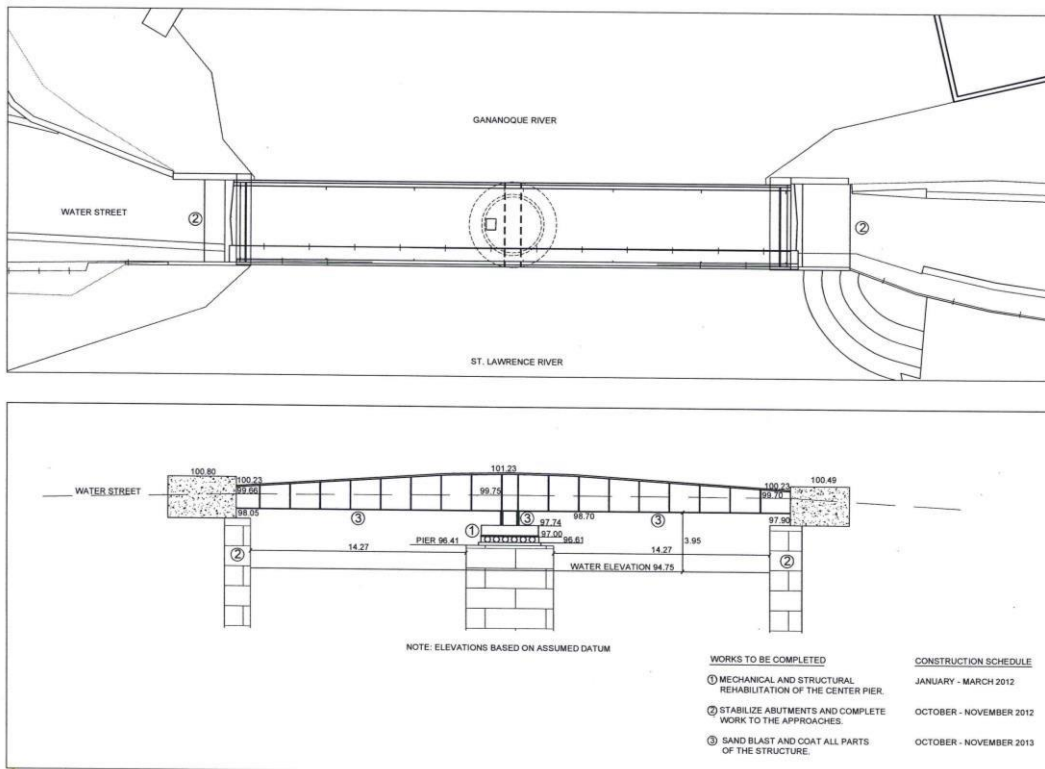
Overhead and side elevation plans of Gananoque Swing Bridge (AECOM, Water Street Swing Bridge Rehabilitation: General Arrangement Drawing, project no. 60219967, Nov. 2011).
